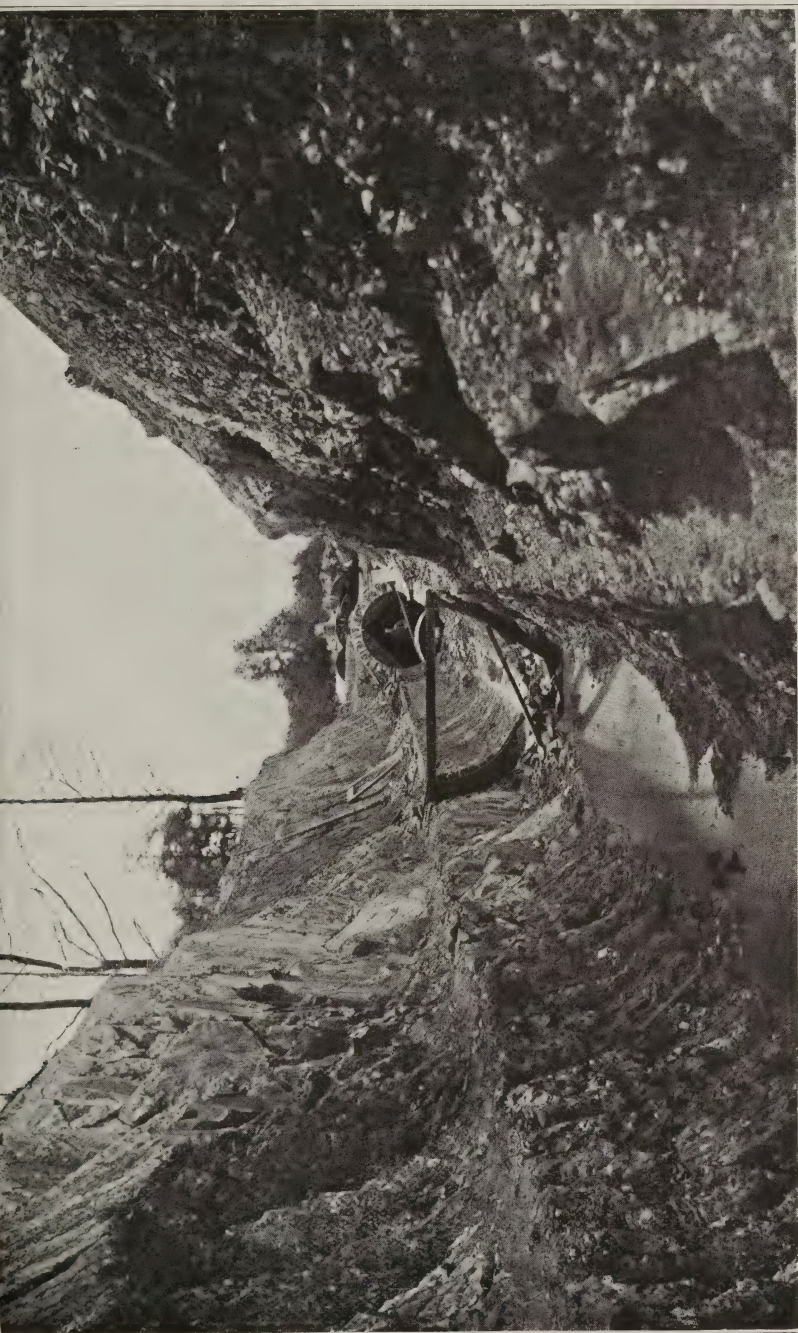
Constructing the 9-foot brick aqueduct through a deep cut.
